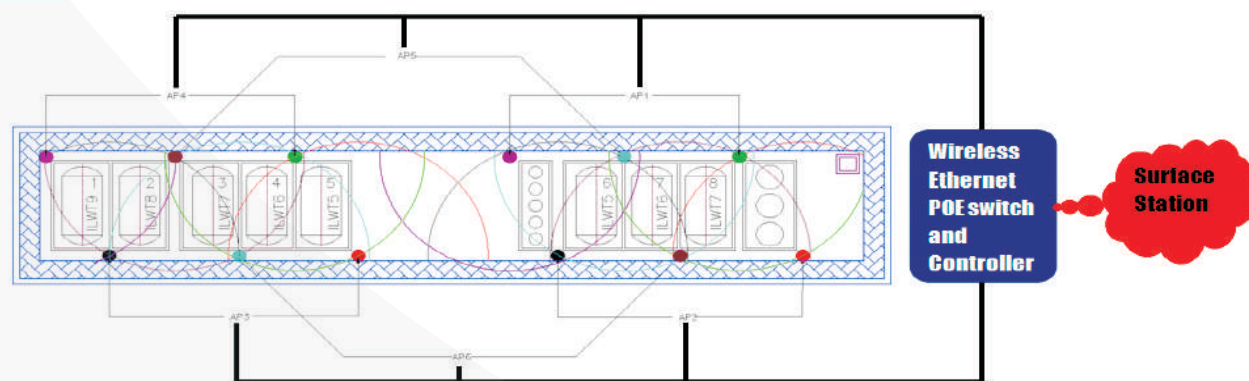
Proposed Design Layout: Antennal Positions in the Underground Vault
